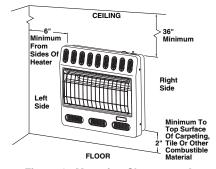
Mounting Clearances As Viewed From Front of Heater
